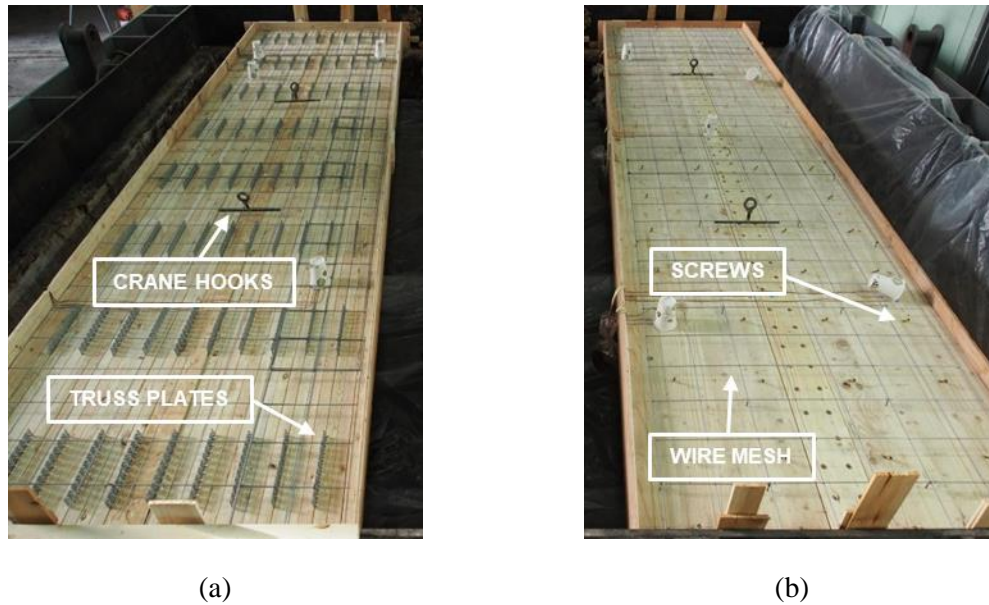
Photographs of the floors during construction showing shear connector layout for the (a) NLT- and (b) CLT-concrete composite floors
